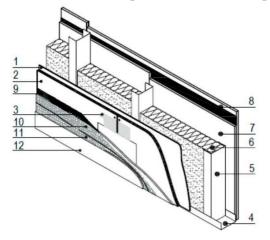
Typical section of a load bearing CFS wall [Reproduced from (Di Lorenzo & De Martino, 2019)]
